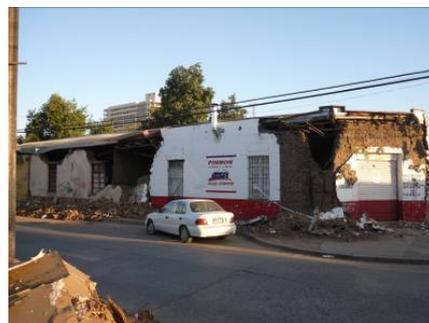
Damage of Adobe buildings (Photo 16-1, Photo 22-1 reprinted)
